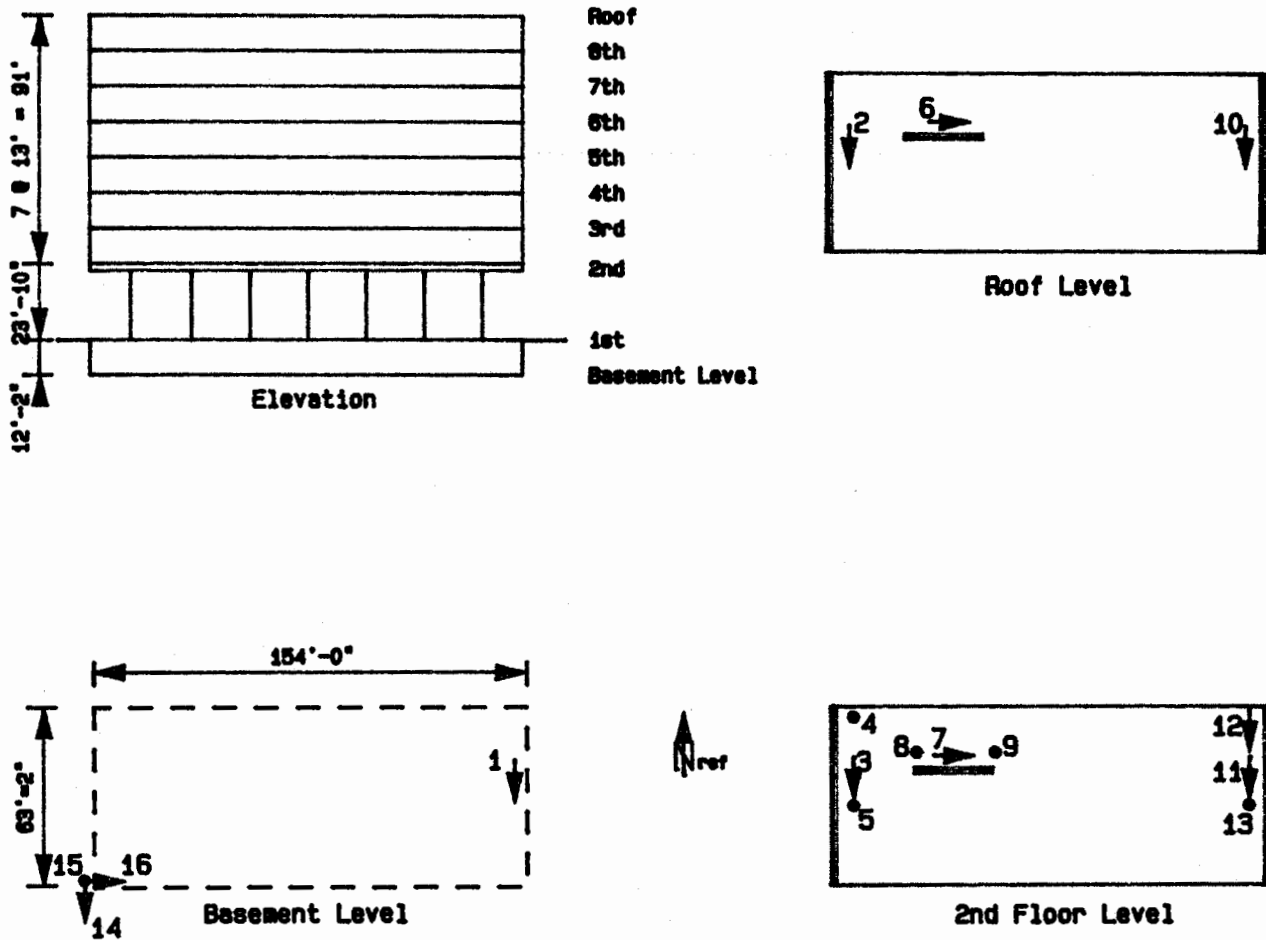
Sensor Layout for CSULA Administration Building (CSMIP Station No. 24468)
